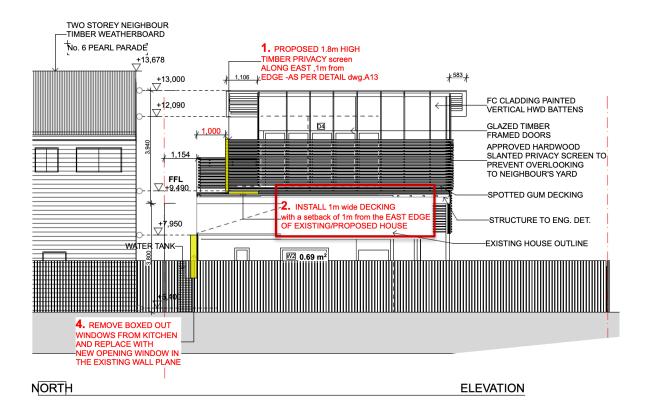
PROPOSED MODIFICATIONS - North Elevation
